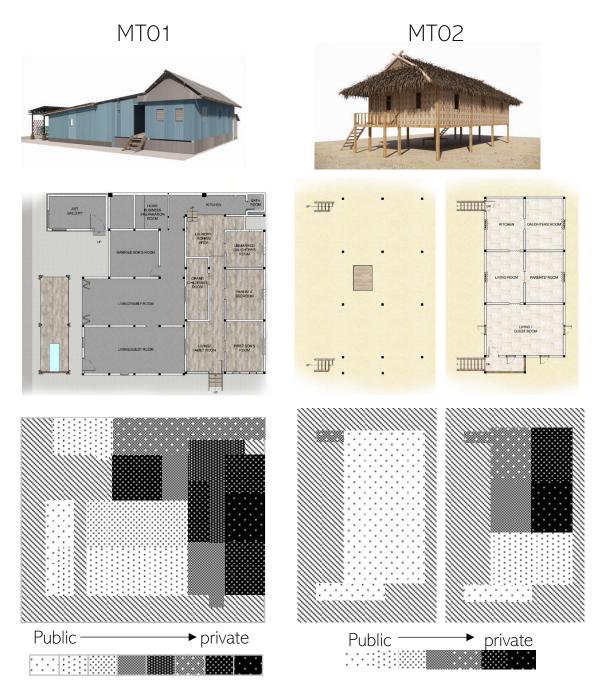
MT's houses in Kampung Tengah with 3D render, floor plan and layout analysis
